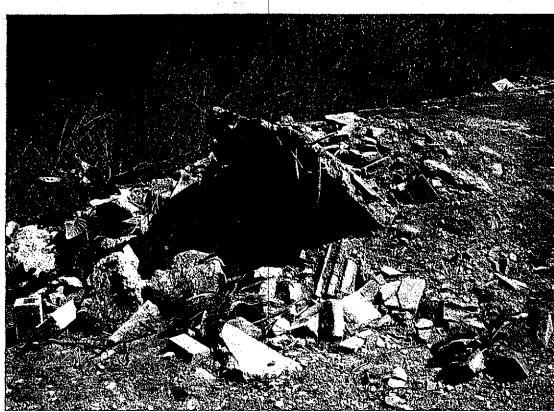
September 2005 site photo. Concrete debris with metal rebar.
